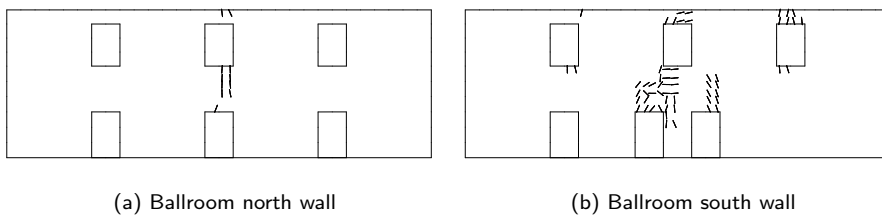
Model crack pattern, tunnel excavation completed, $V_L = 3.3\%$, upper floors.
